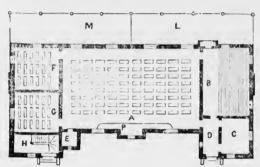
,-Ground Plan (Girls' School), adapted to Fig. 133,
